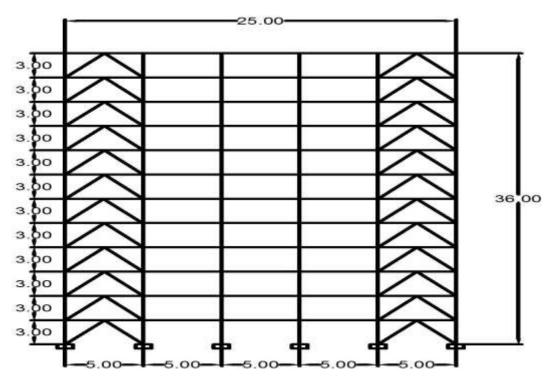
Elevation of 12 storey building with inverted V-bracing in longitudinal direction
